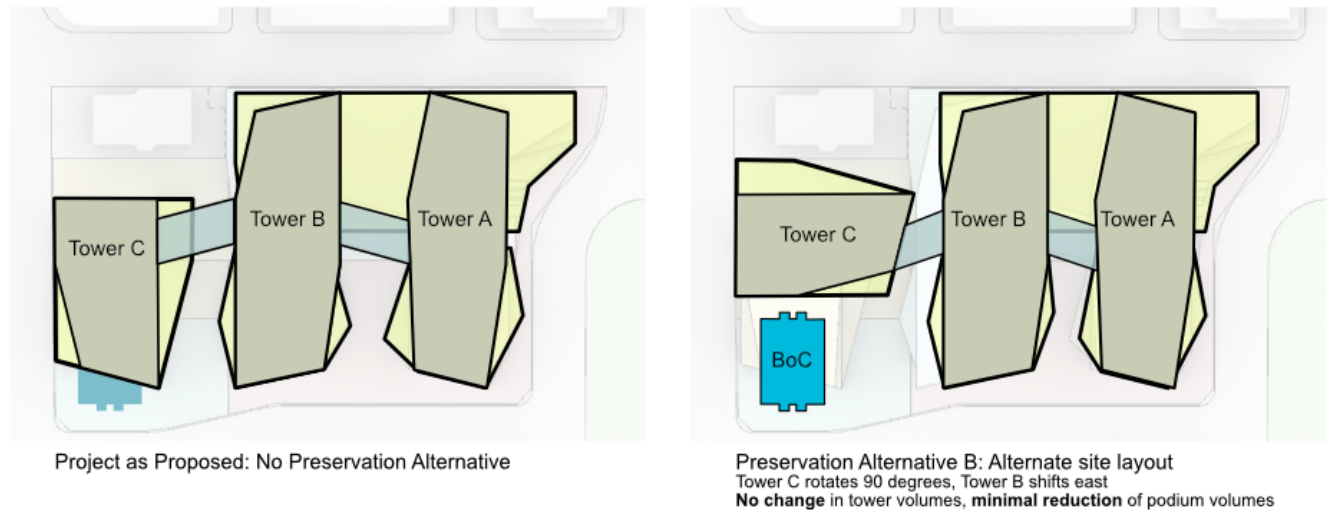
Preservation Alternative B: Alternate Site Layout (rendering by PAC*SJ)
